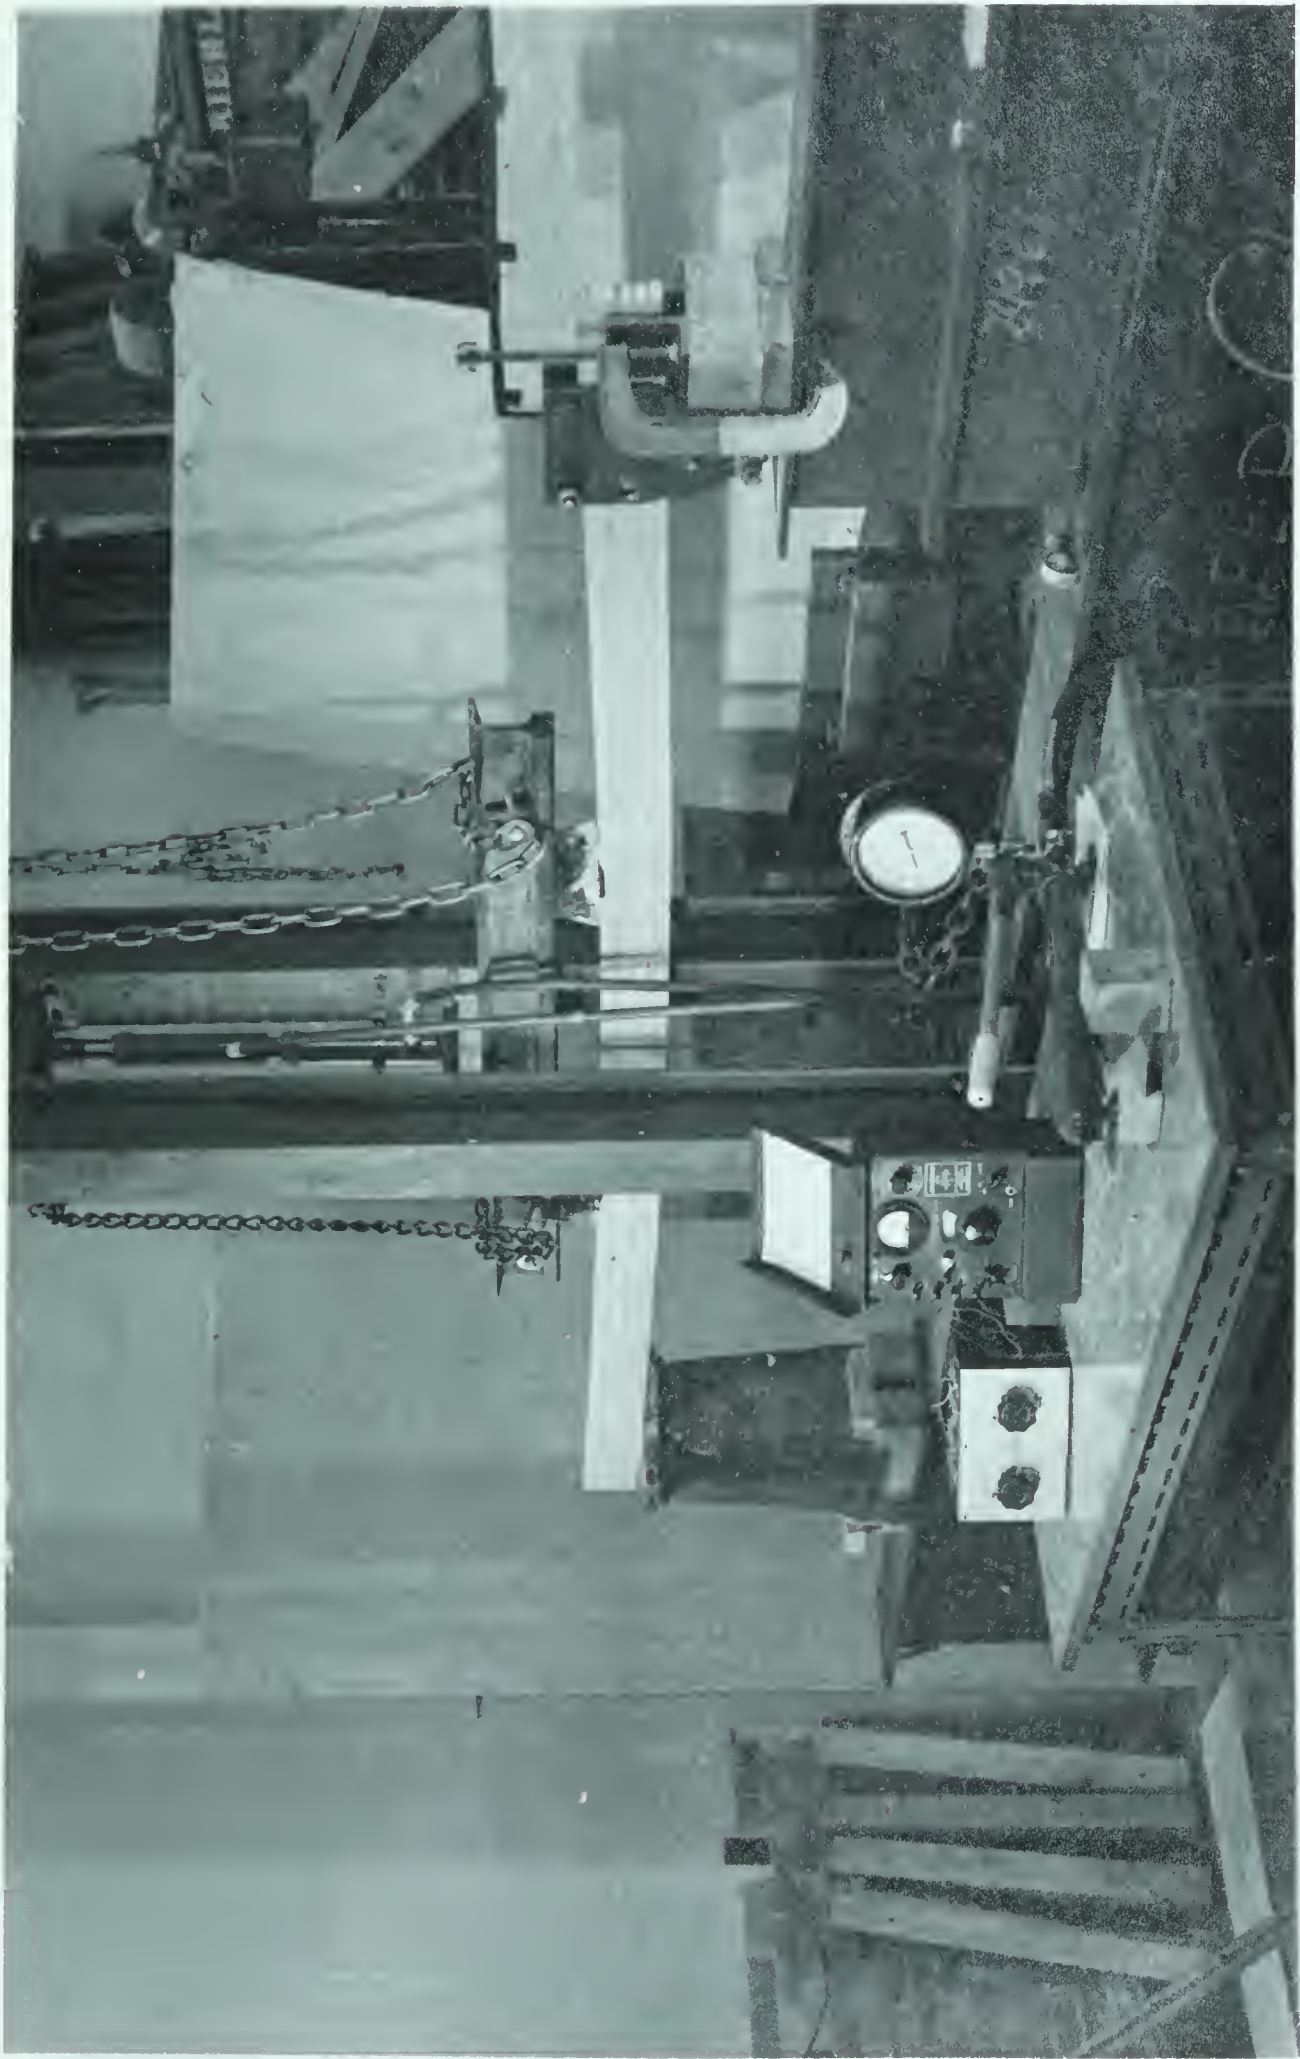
Elevation View of Beam Testing Apparatus.
